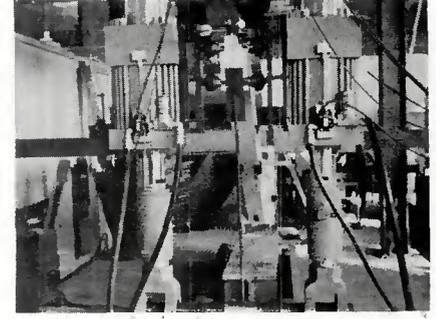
Loading end of beam column showing ball-bearing supports and loading link
